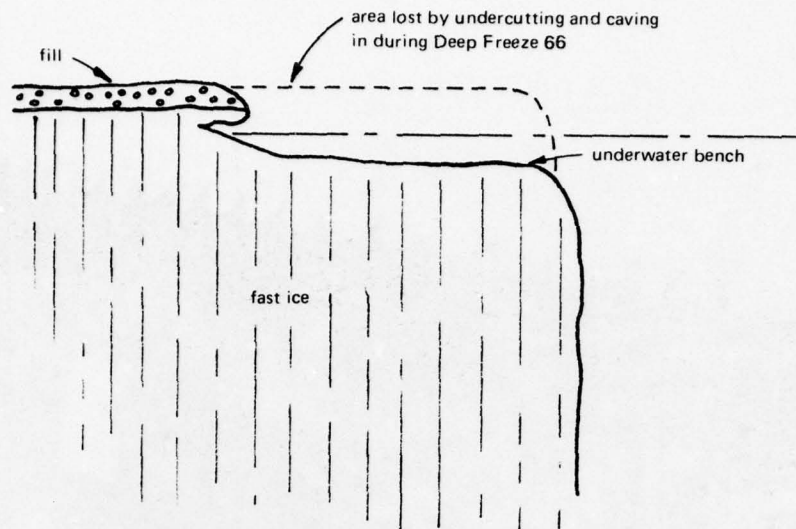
Diagrammatic cross section of wharf showing loss of surface, undercutting and underwater bench.
